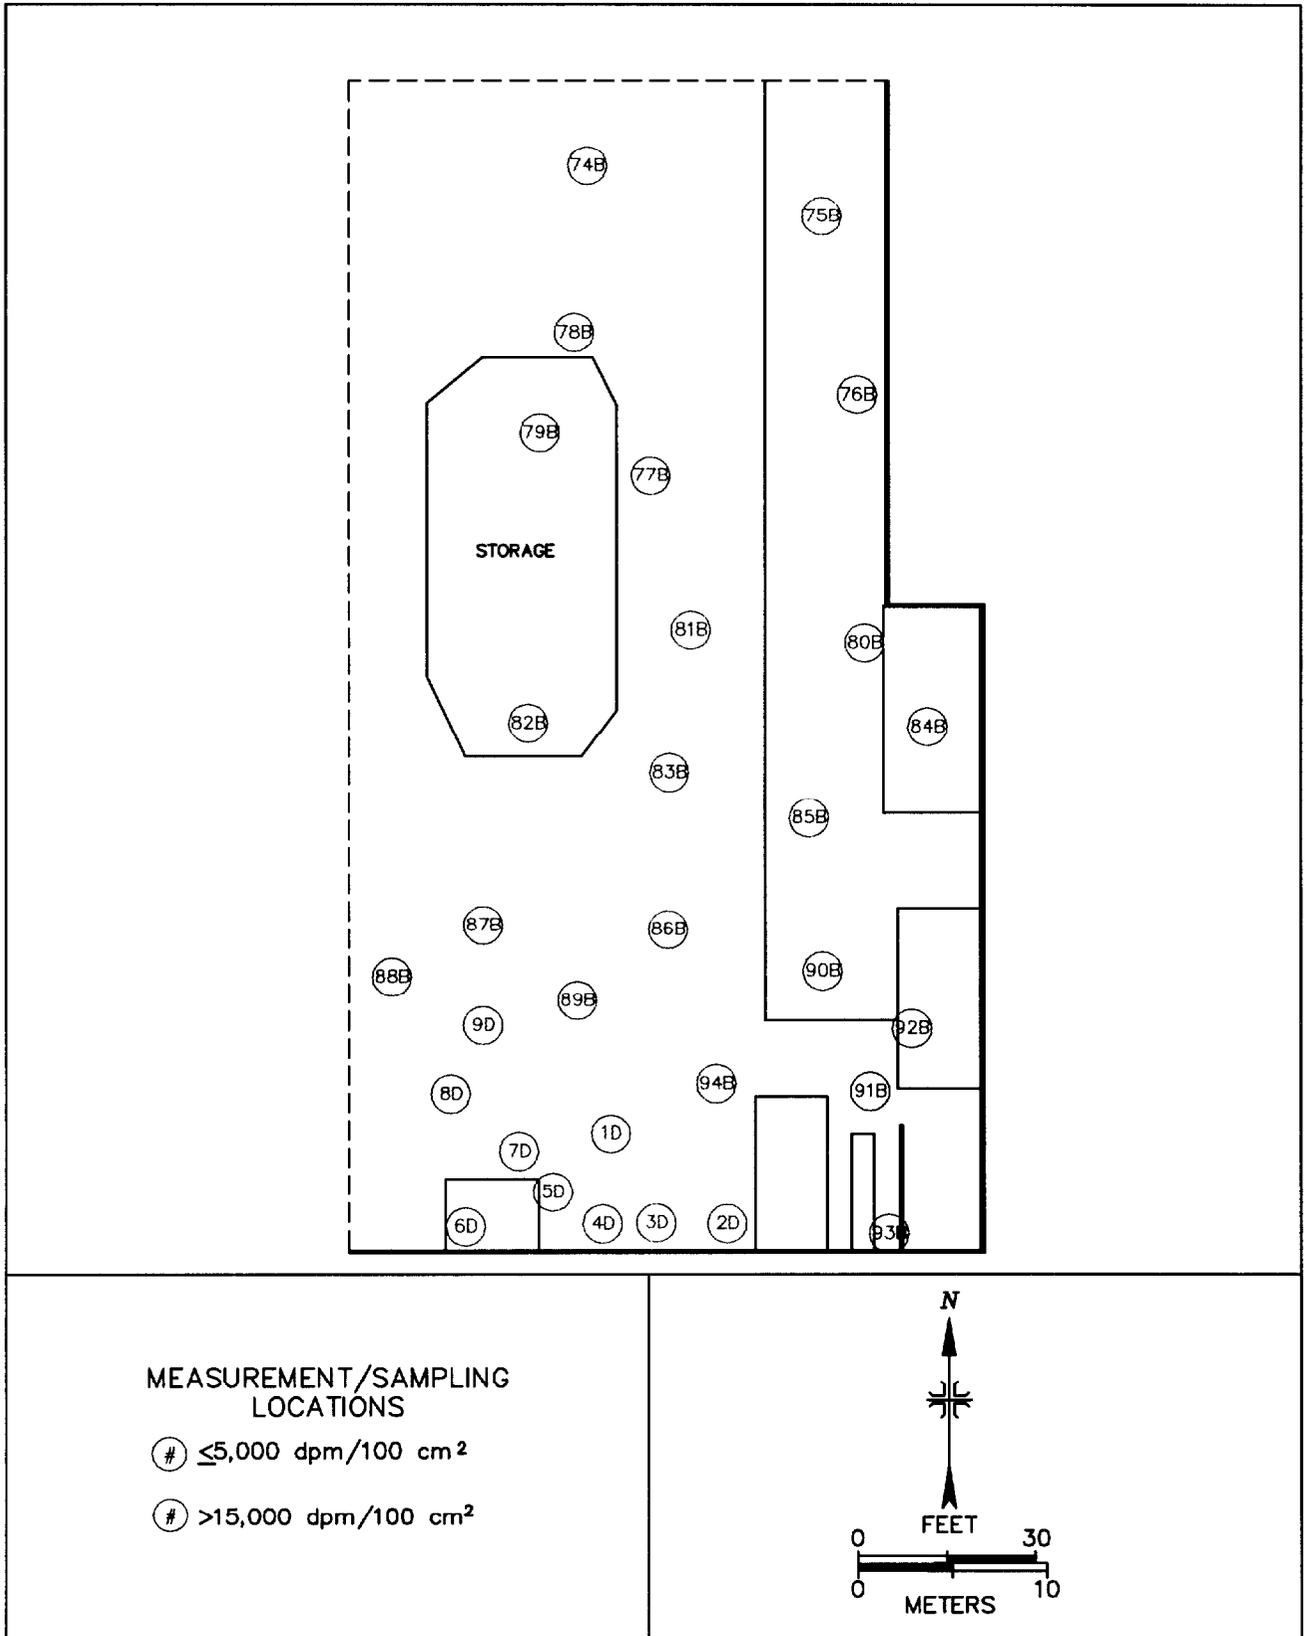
Building 24, Southeast Area, Floors, Lower Walls, and Equipment – Direct Measurement and Sampling Locations
